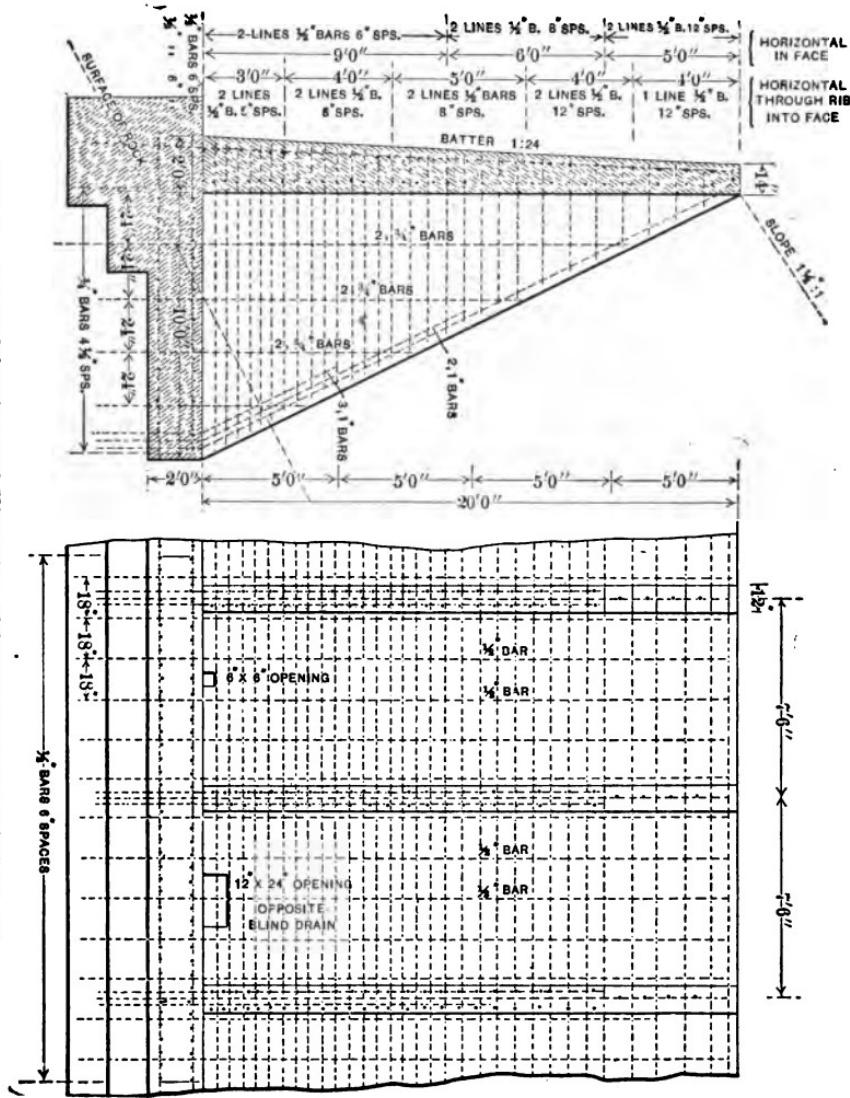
Typical Section and Elevation of Retaining-wall at Bridge 123.
